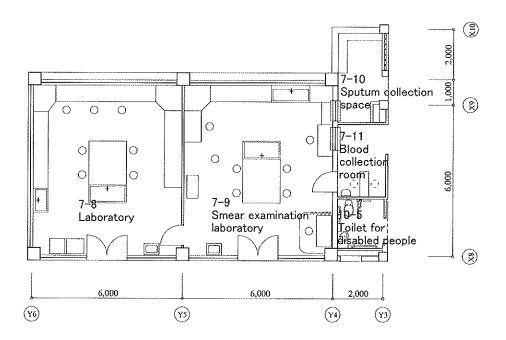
Laboratory and Smear Examination Laboratory
